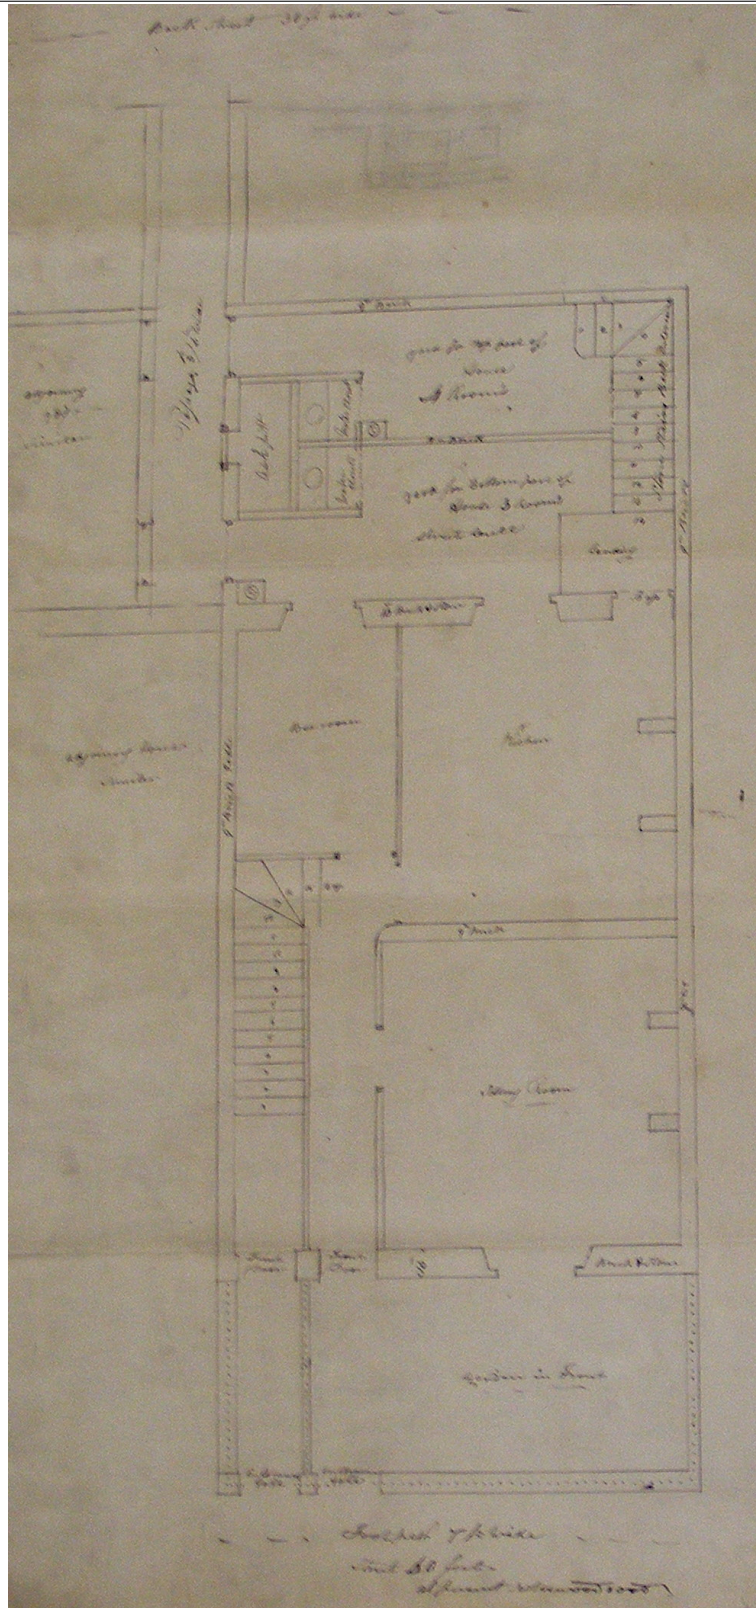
1855, Scotswood Road, ground floor, internal plan (T186/30)
